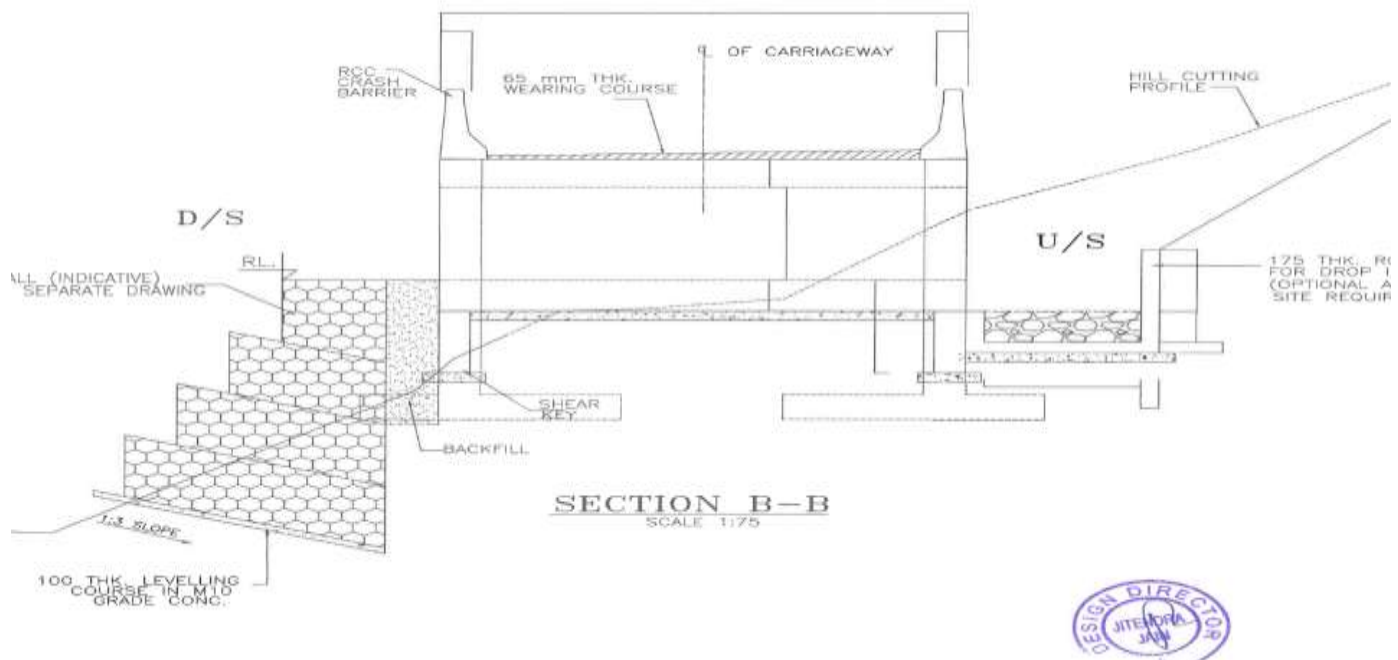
Cross section of box culvert along road (Source: NHIDCL, PMU-Kalimpong)
